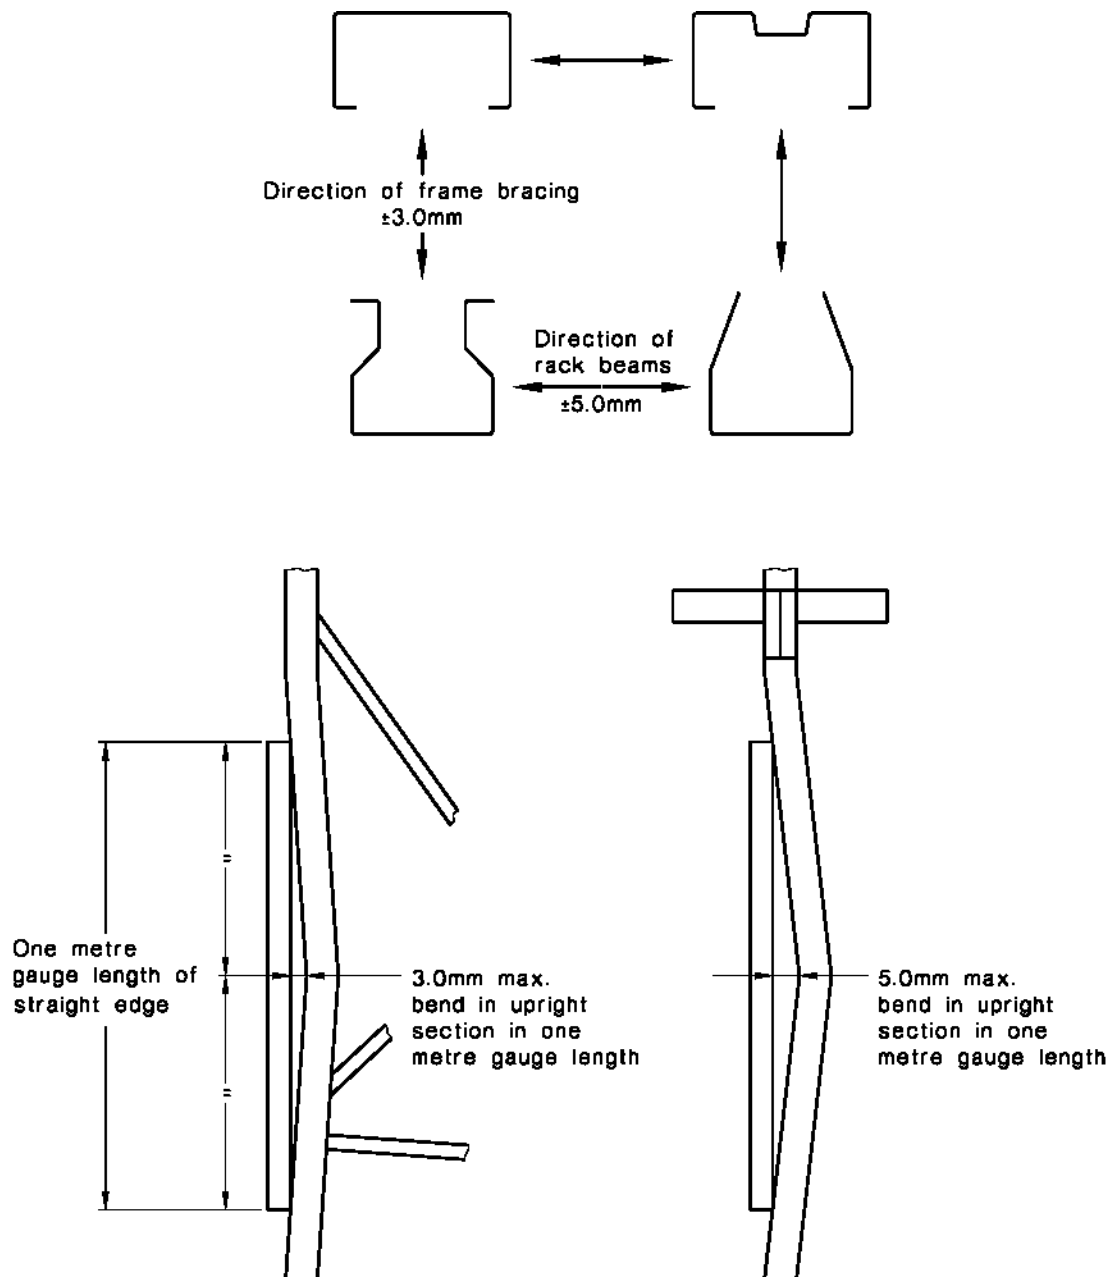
TYPICAL UPRIGHT SECTIONS AND METHOD OF MEASUREMENT
